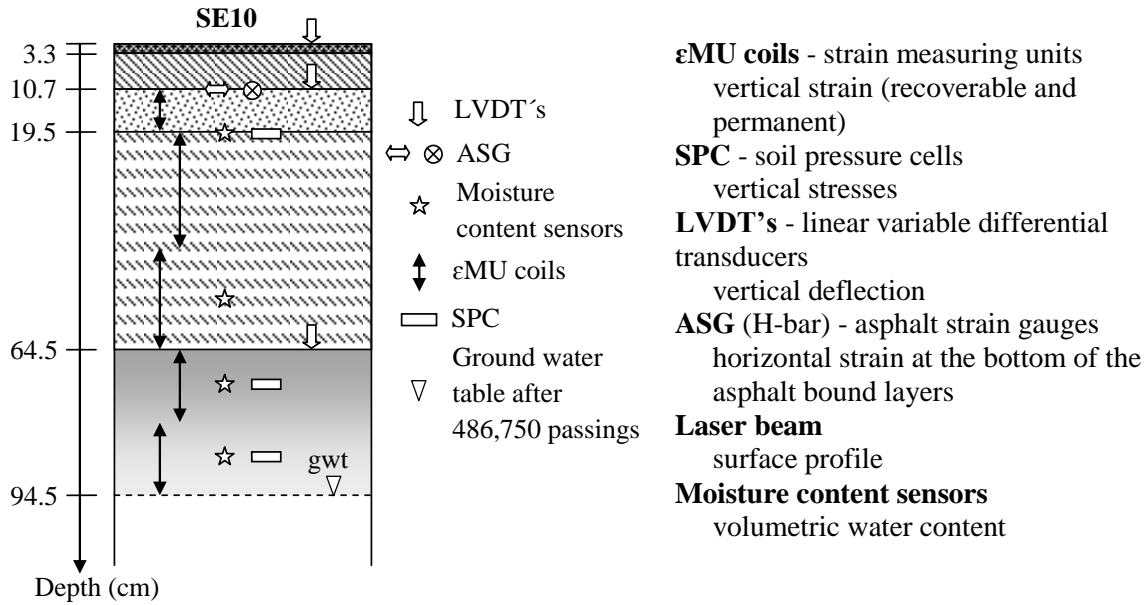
A cross-section of the pavement structure SE10, including the instrumentation embedded within the structure. The structure consisted of asphalt concrete, bituminous base, granular base course, subbase and subgrade.
